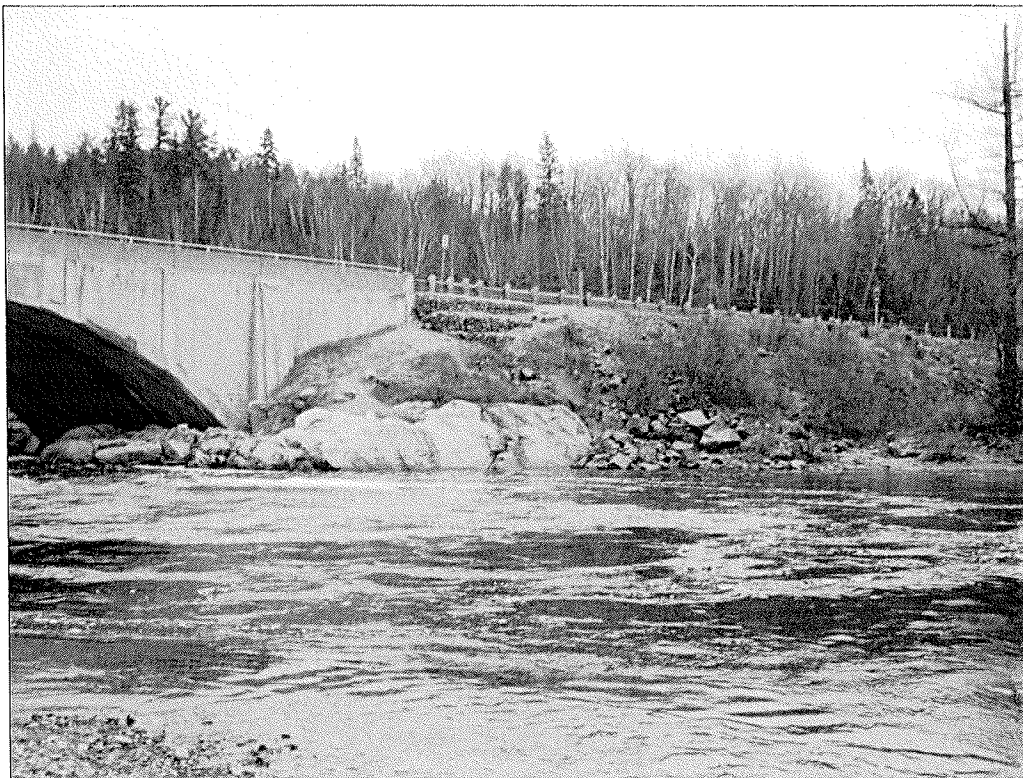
and 2 – General view of the south side of the Chippewa River Bridge (downstream)
